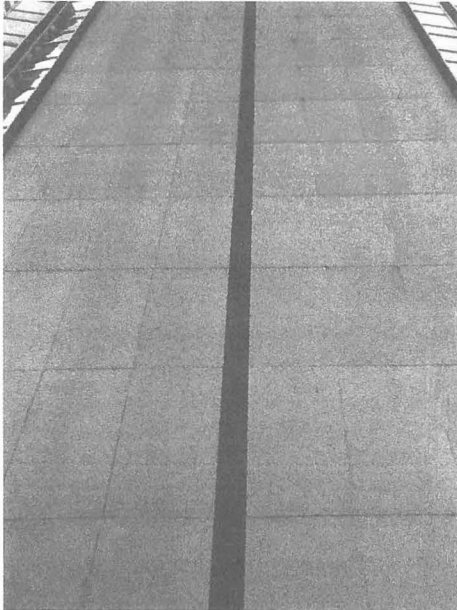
Precast concrete cladding of Building #2. Note the tightening of joints between panels, causing localized distress.
